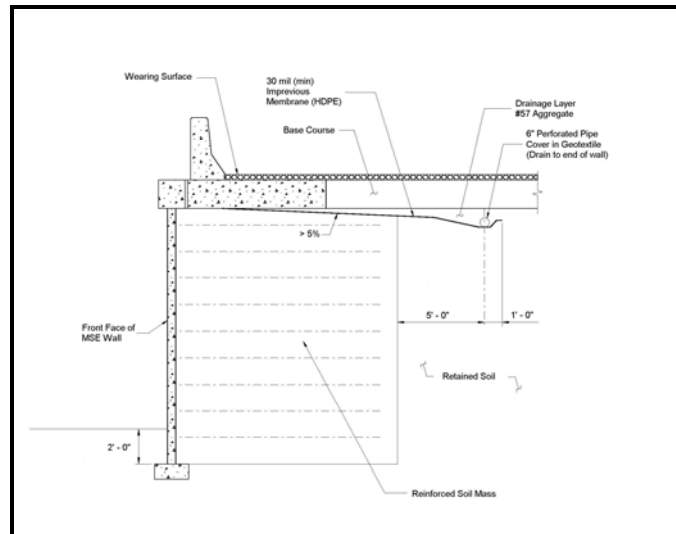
, Drain Behind the Wall Backfill (Earth Retaining Structures – June 2008)
